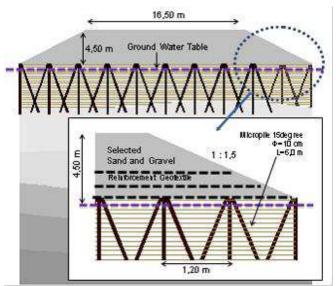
Cross section of wooden pile reinforced embankment tested by Harianto et al. (2016)
